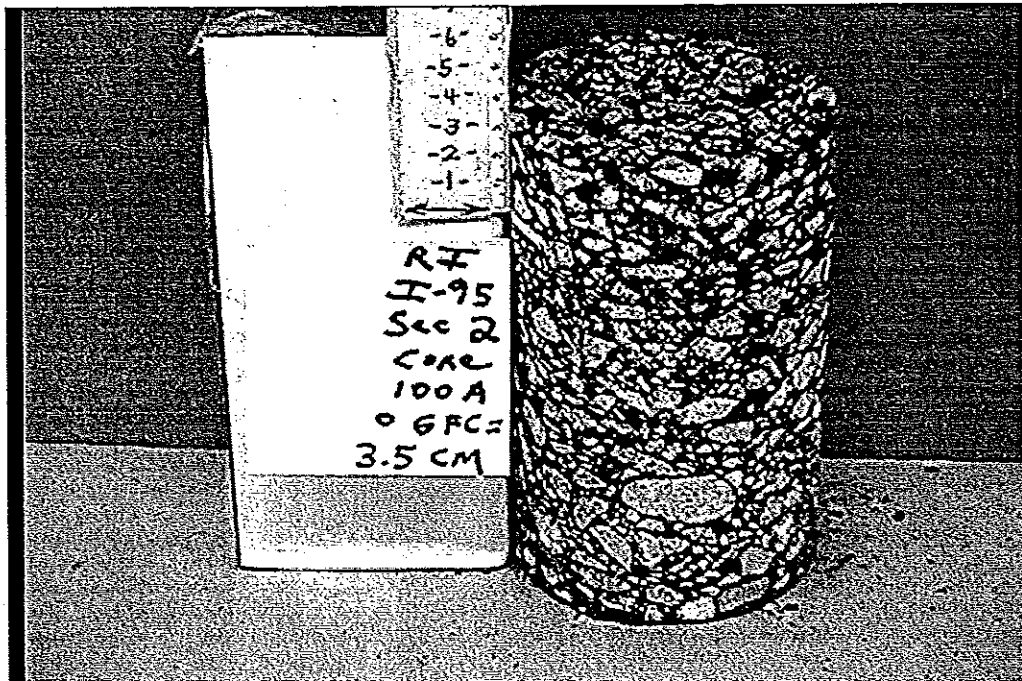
I-95 SB – MM12.0 Close-up of Typical Core (0-200 ft)
